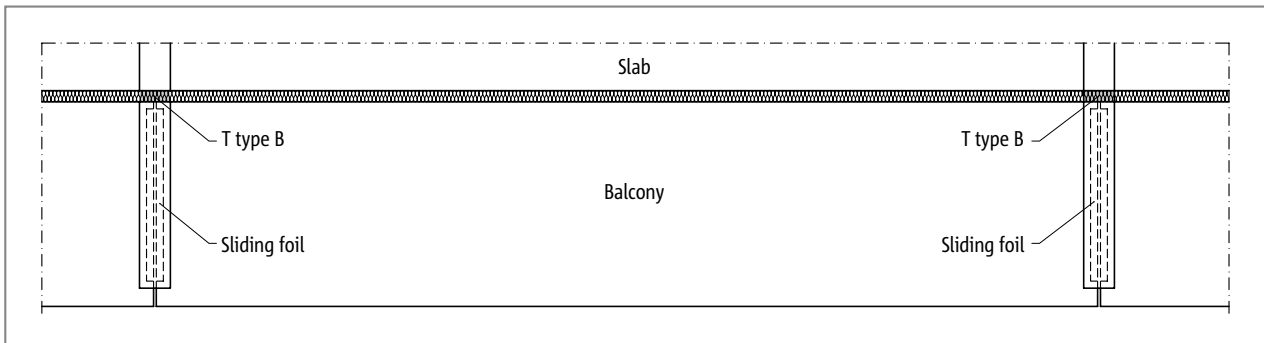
Schöck Isokorb® T type B: Balcony construction with free cantilevered inner slab joists (precast balcony)
